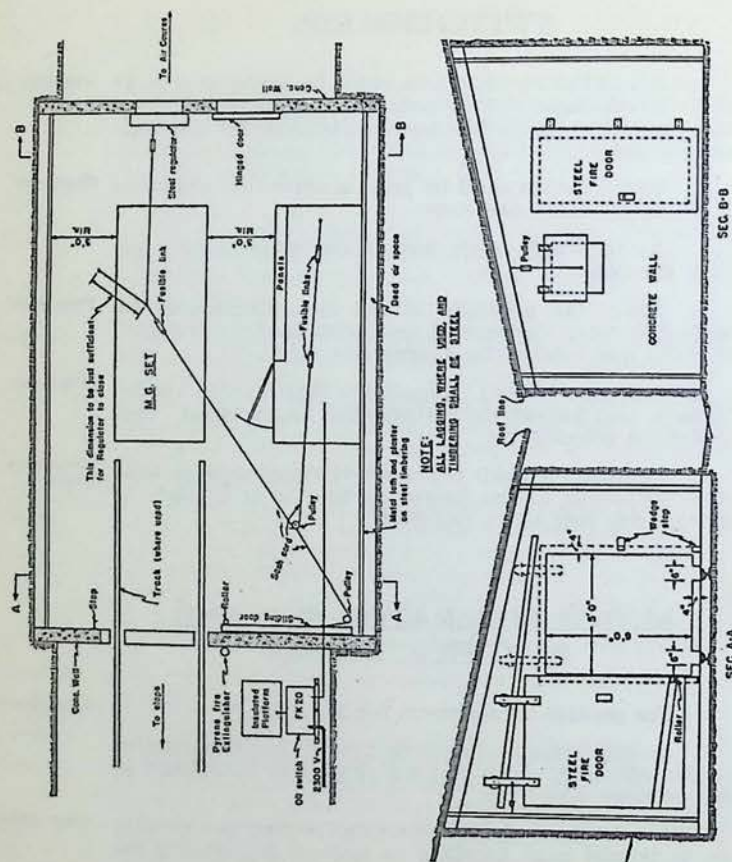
Method of Fireproofing Motor Generator Set and Rectifier Rooms.
